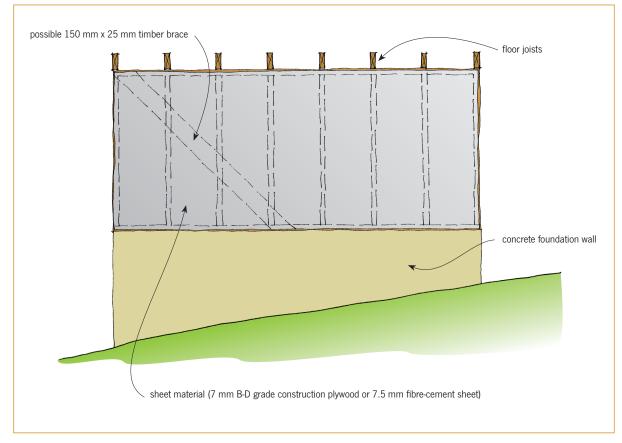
System for strengthening jack-framed foundation walls against earthquakes
